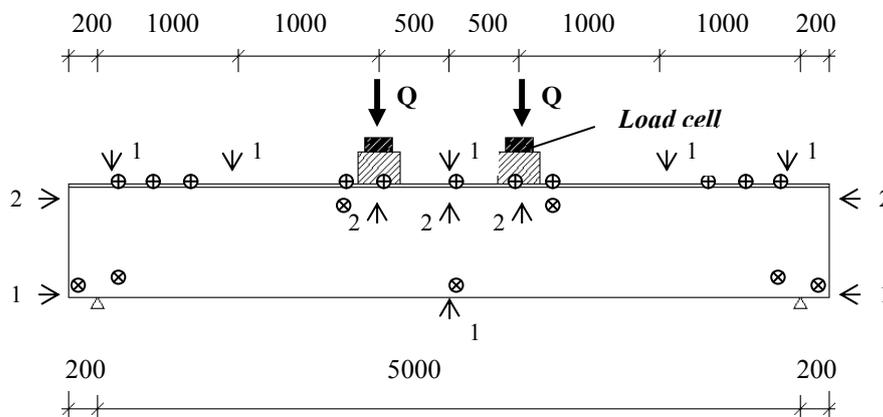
Set-up for the load test. Arrows denote LVDT transducers (number stands for one transducer in centre of beam and two transducers on corresponding sides respectively). Cross denote schematic placement of strain gauges (vertical cross for gauges in the deck and diagonal cross for gauges on the FRP beam).
